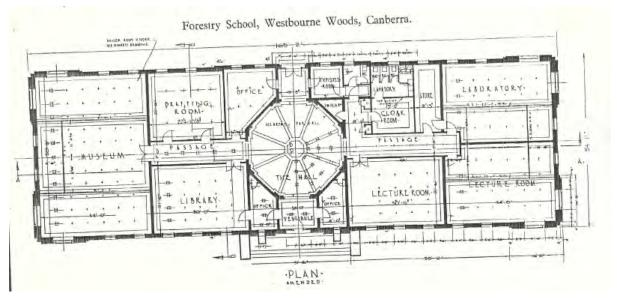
Amended floor plan of the AFS building (CSIRO Black Mountain Library)
